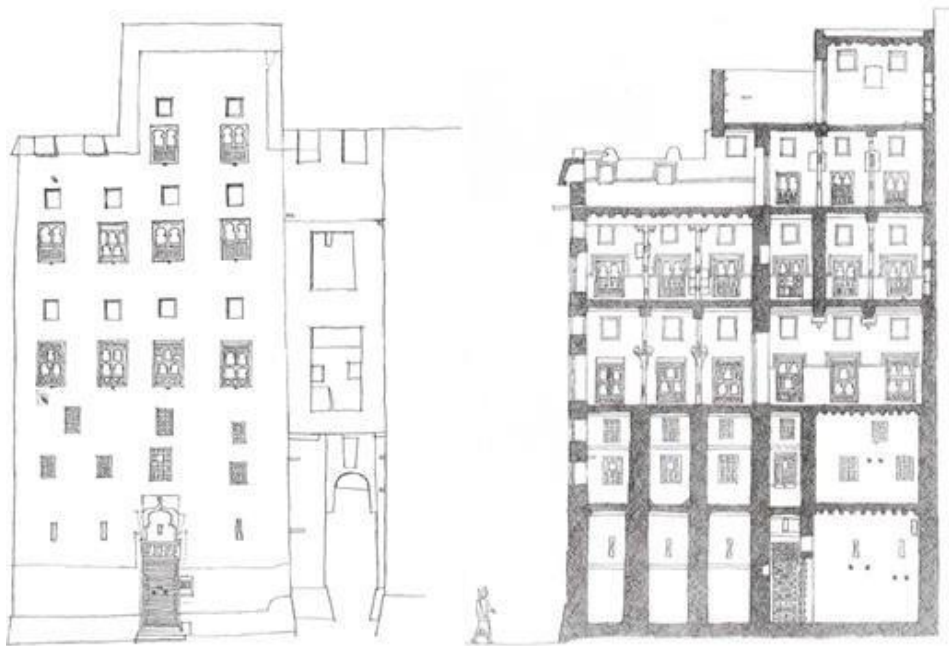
The art of the Tower House: Section and elevation of house B 37, Shibam
